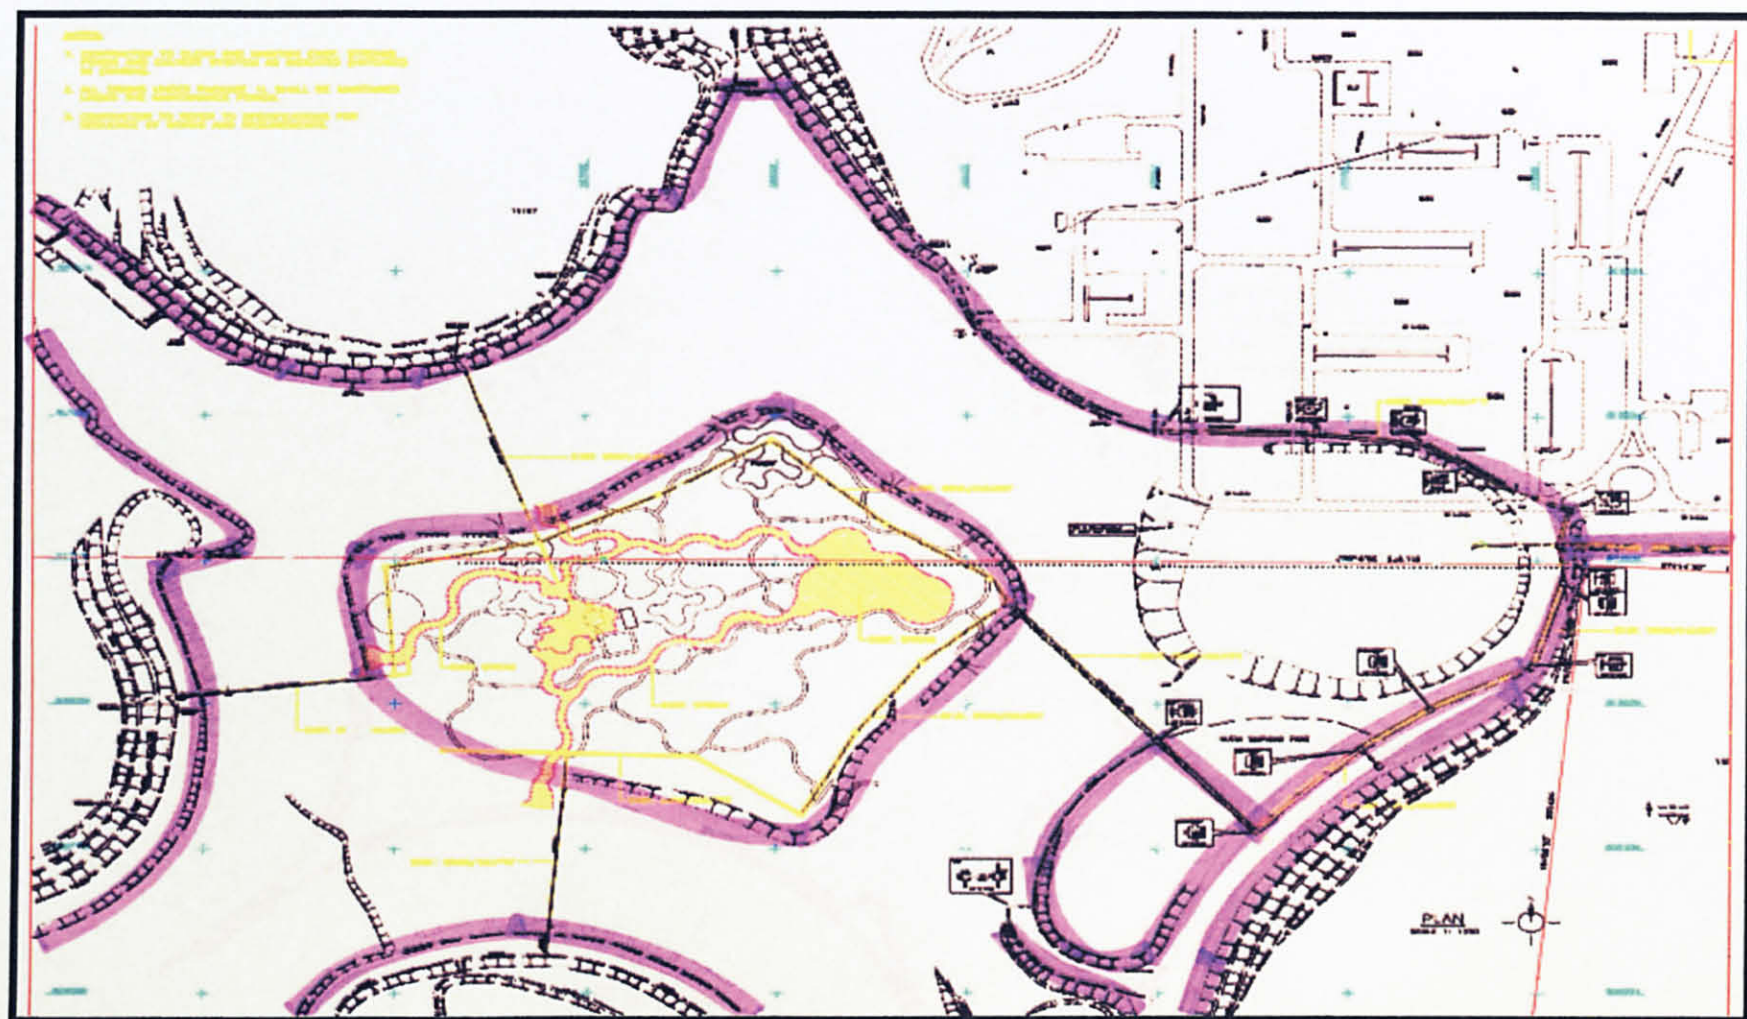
Detail Layout of the New Academic Complex, UTP
